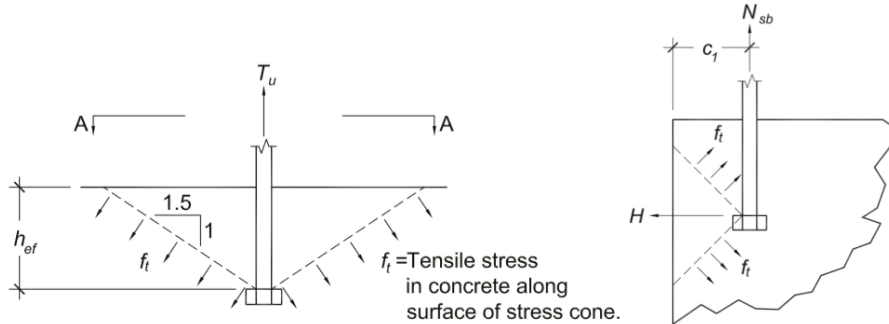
Breakout cones caused by tension and lateral bursting force when anchor is near edge.⁶⁸
